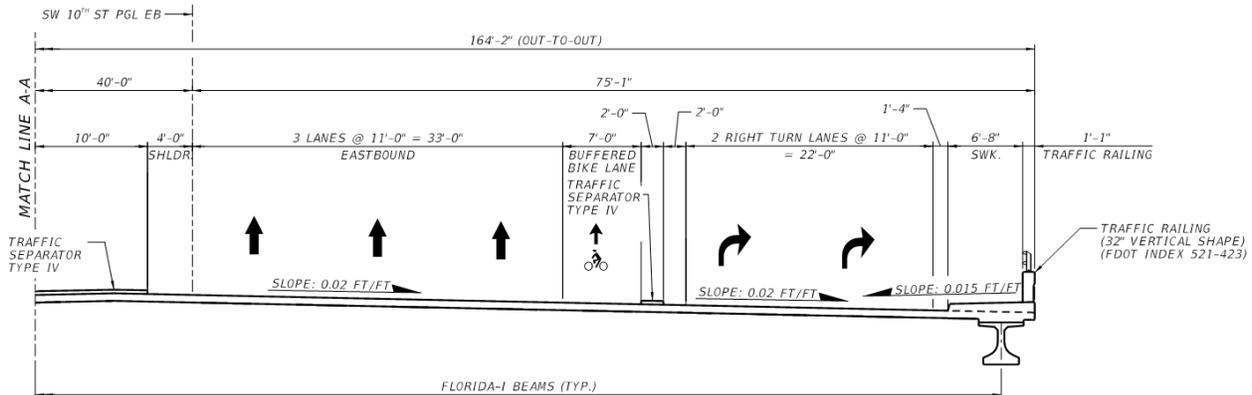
Bridge Typical Section (Bridge No. 12) 2 of 2
